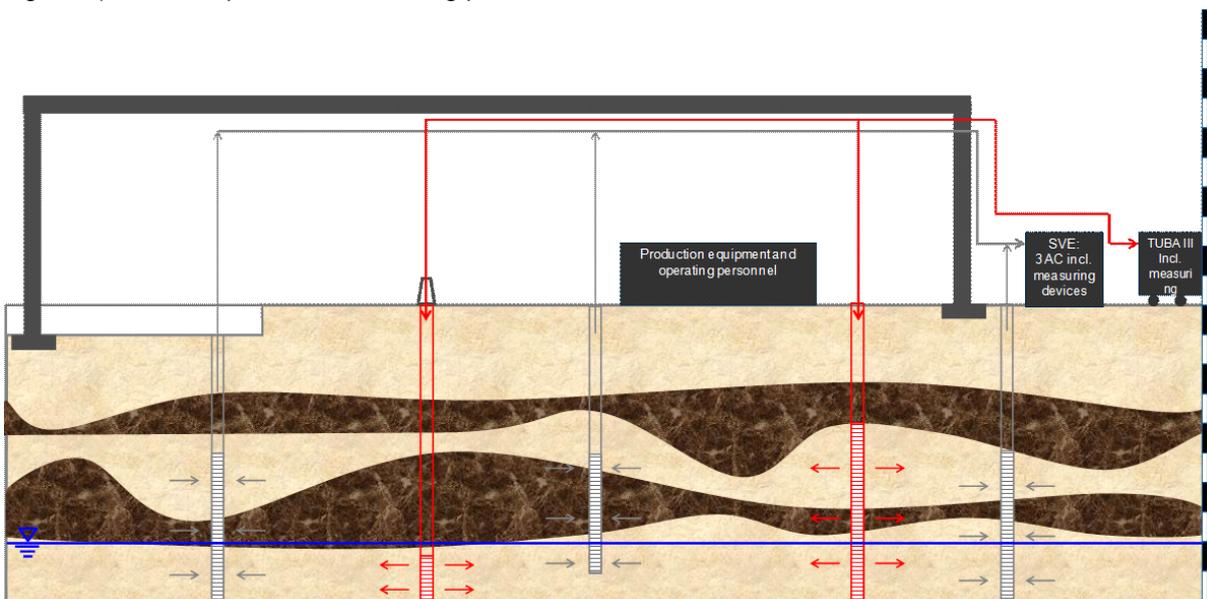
Cross section of the steam enhanced extraction (SEE) beneath a building
